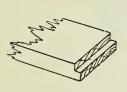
and 793.—Directions of Grain in Floor Boards.
